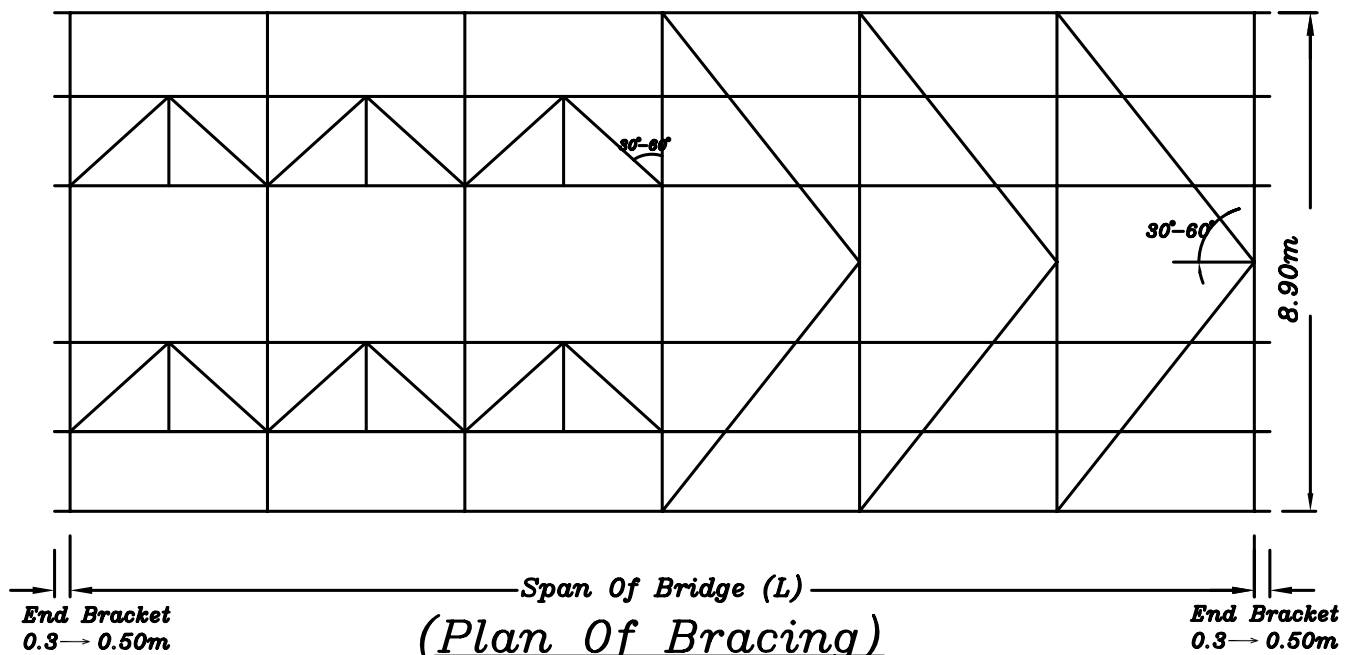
# PLATE GIRDER SEMI-DECK BRIDGE RAIL WAY WITH U-FRAME (DOUBLE TRACK)
